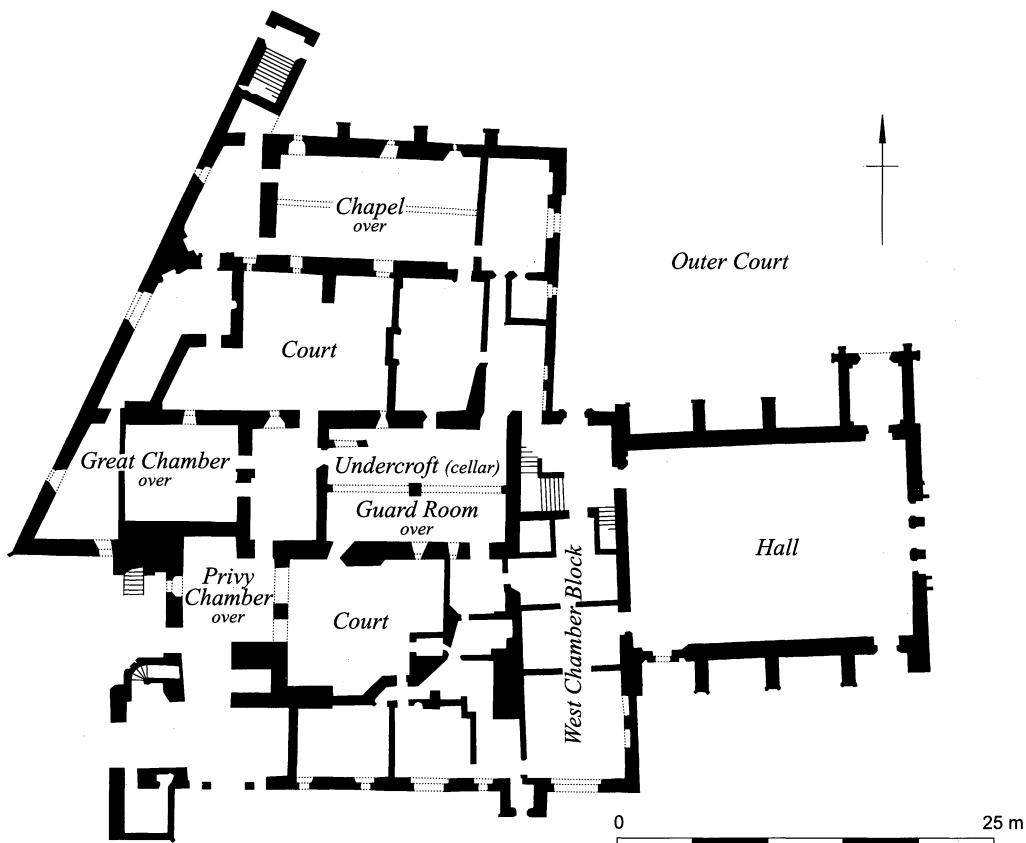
Old Palace School, Croydon: Ground floor plan of existing buildings at Old Palace School (after Faulkner 1970, fig 4 with modifications).
